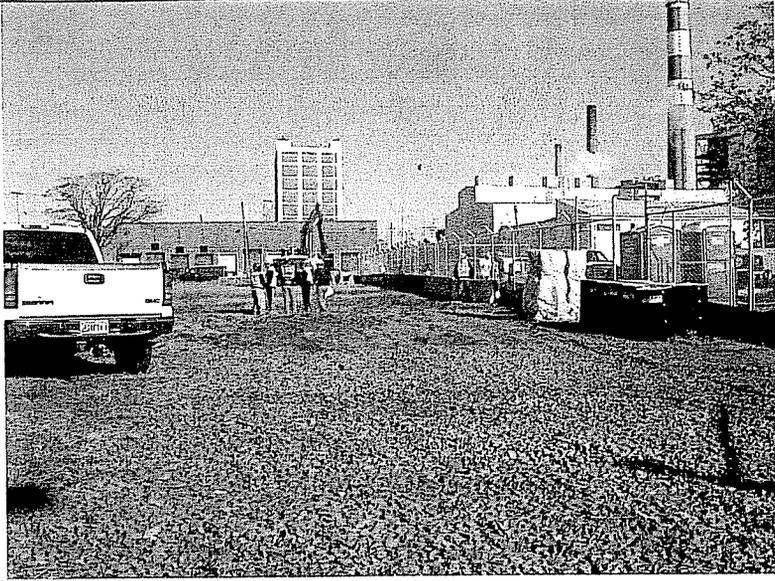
Singer Substation, view to north, anti-tracking pad, jersey barriers, and drums in preparation for commencement of site work.
